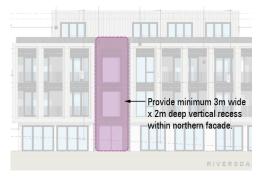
Extract North Elevation (TP-10) showing encroachment into B17 profile.
